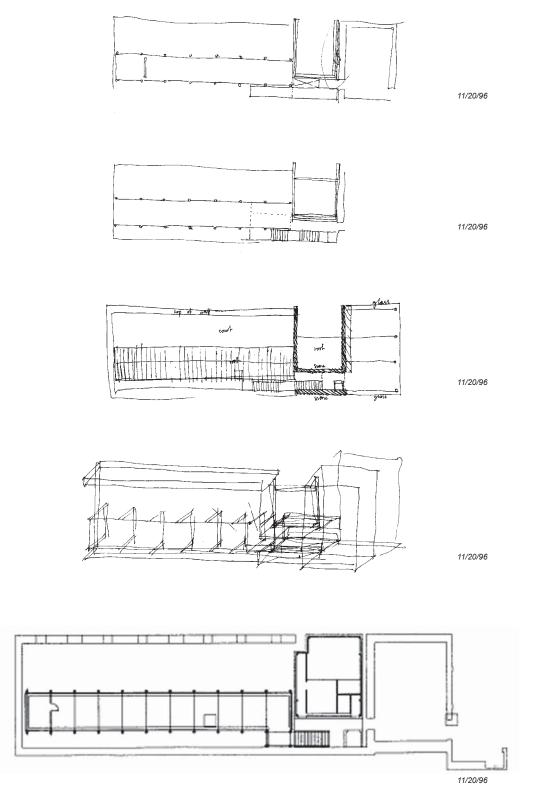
, 41. Workroom becomes suspended within Columbia Mill foundation.
